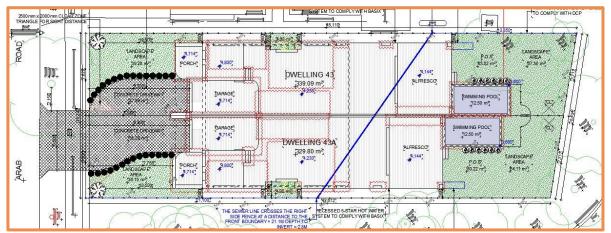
Submitted landscape Plan (Source: Campbell Hill Group)
